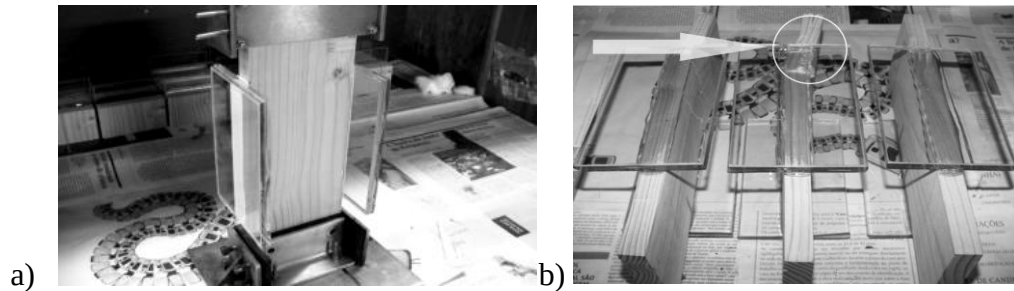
and b: Timber reinforcement with transversal glass plates [29]
